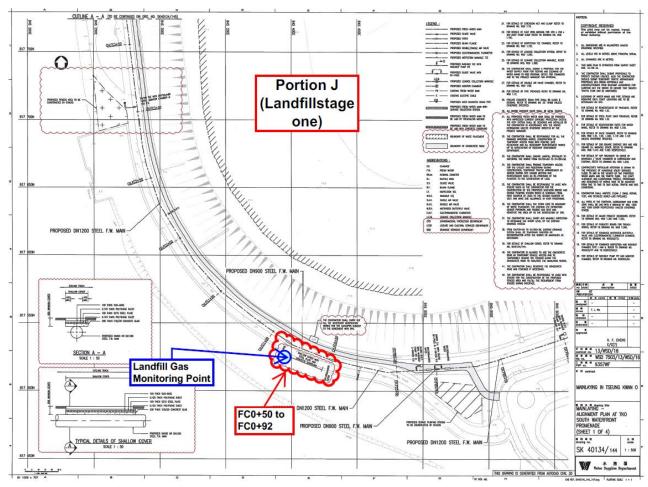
Location Plan for Portion J – Landfill Stage 1 (FC0+50-FC0+92)
